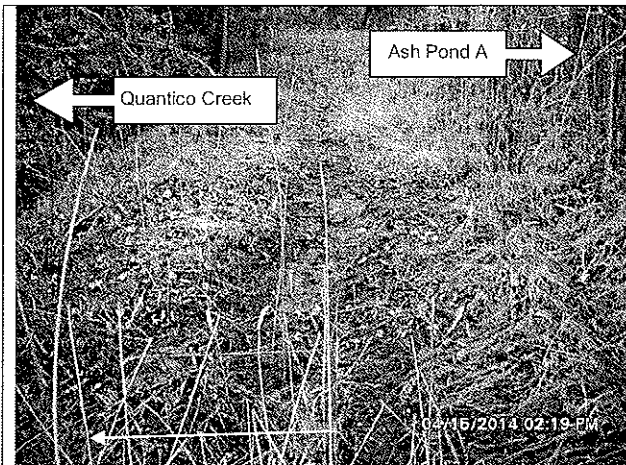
Berm area adjacent to Ash Pond A. The arrow points to the area of the breach. Note standing water on berm.
